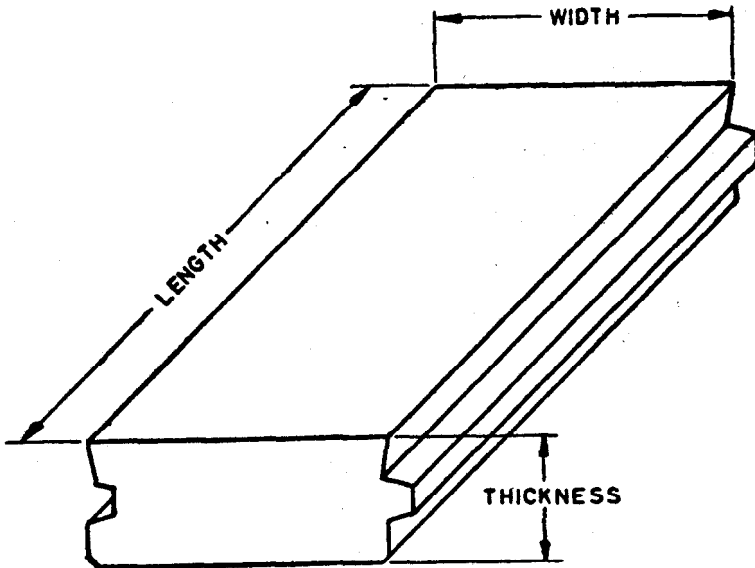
ILLUSTRATING DIMENSIONS OF FLOOR AND ROOF SLABS
